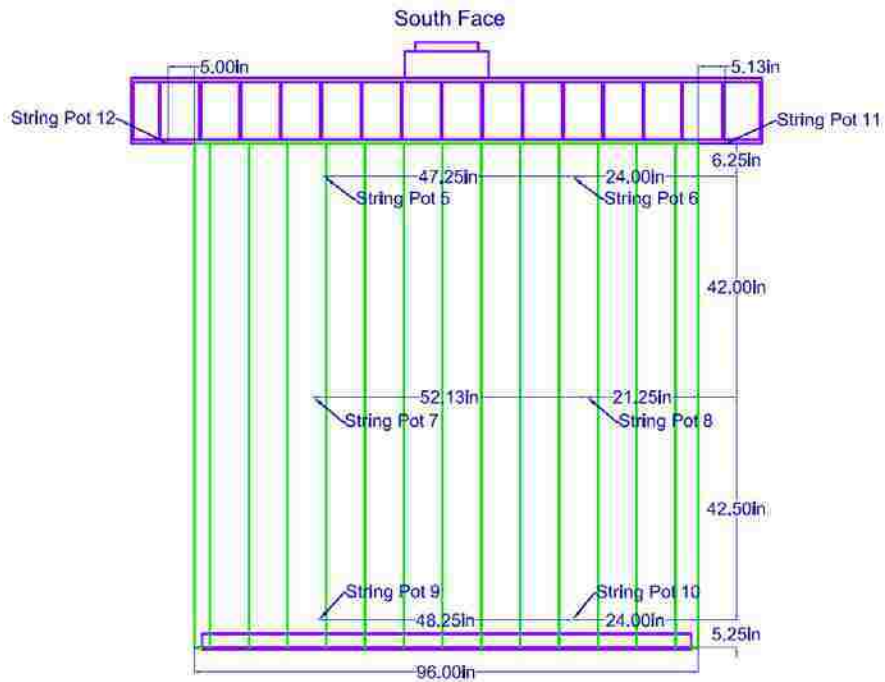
String Pot Locations for the In-Plane Vertical Load Test, South Face
